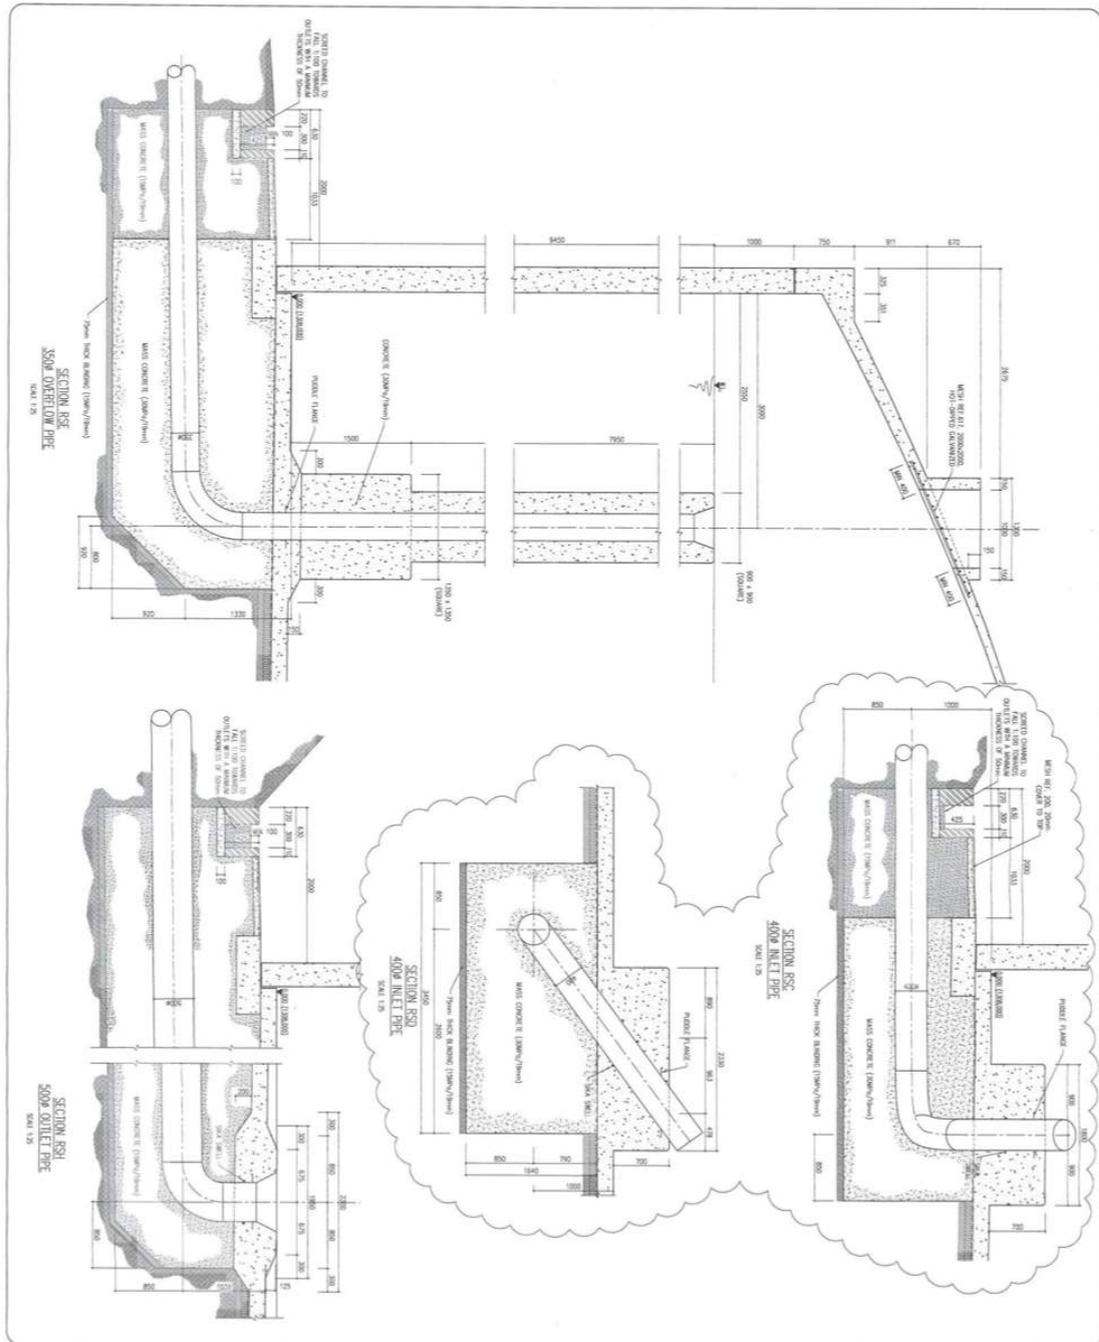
9Ml - Dome Roof Reservoir Pipe Detail Sections [Kruger, 2014]
